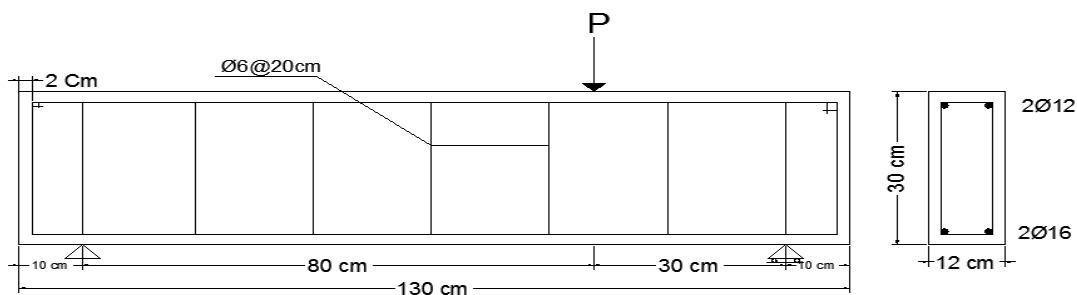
Details of First Group Tested Beams (A<sub>1</sub> to A<sub>5</sub>)
